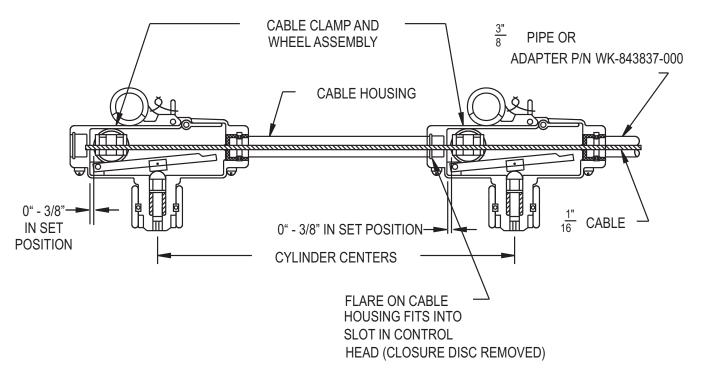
Installation of Tandem Cable Operated Control Heads
